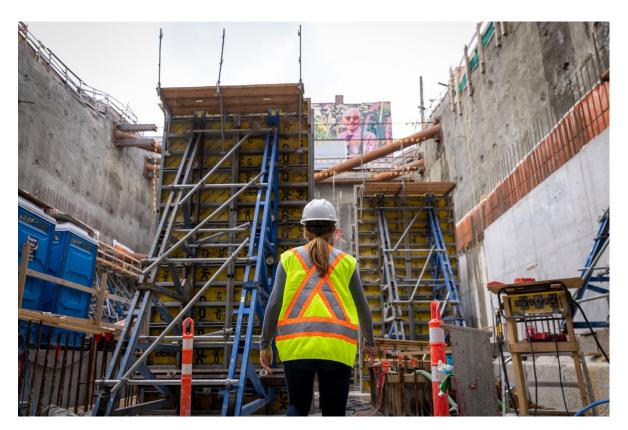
Mount Pleasant Station: Formwork for concrete pours to construct walls for the headhouse.
